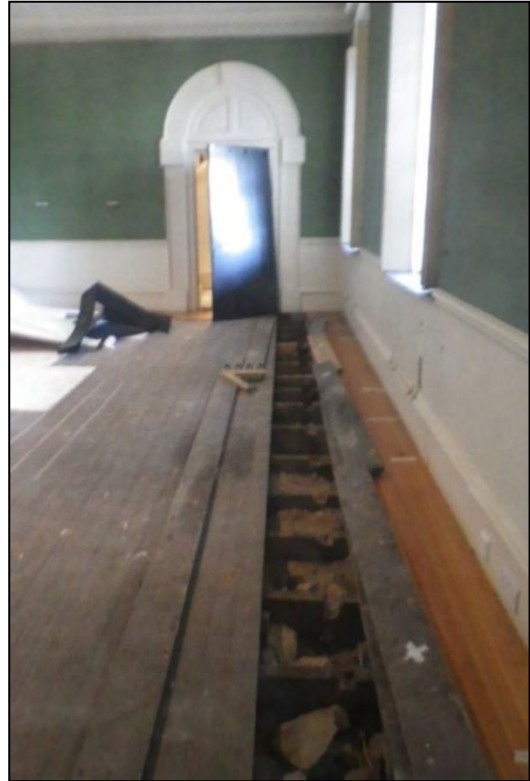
removal of the floor in the front office for installation of new pipework for heating.
